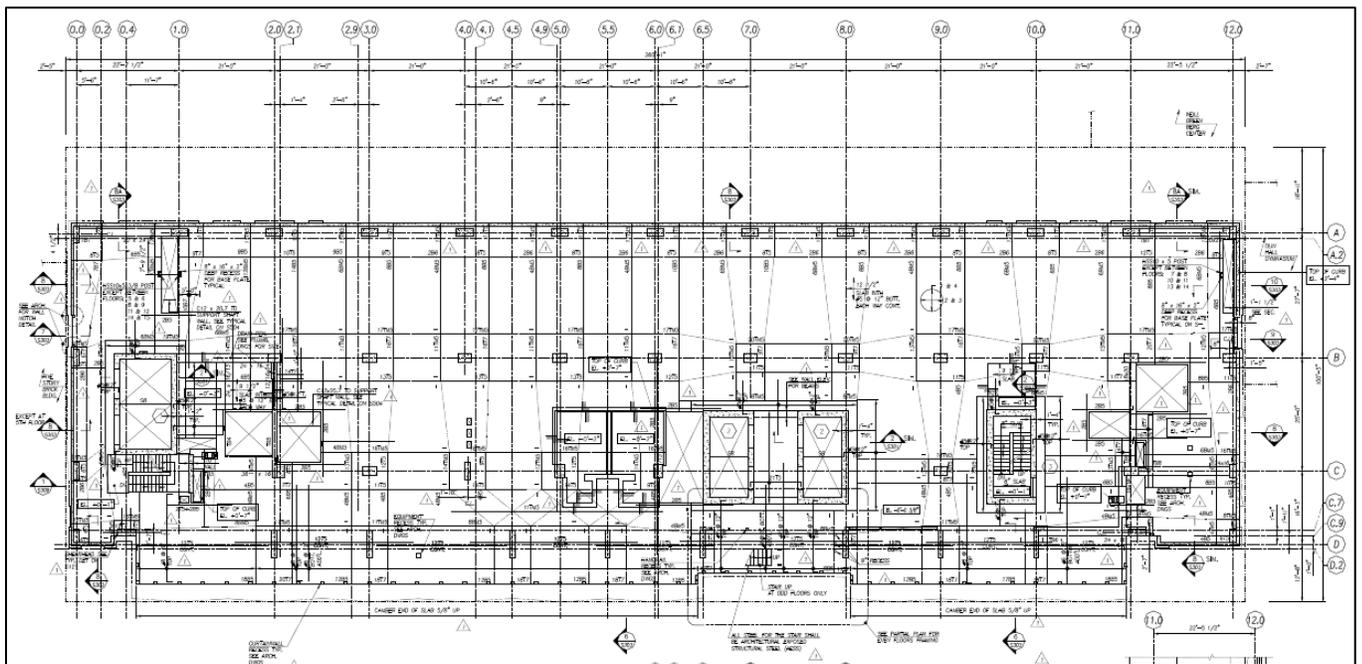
Typical Framing Plan – 5<sup>th</sup>-15<sup>th</sup> Floors
